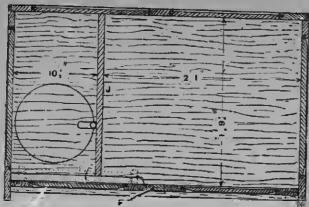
Horizontal Section through Bedroom Lavatory.
